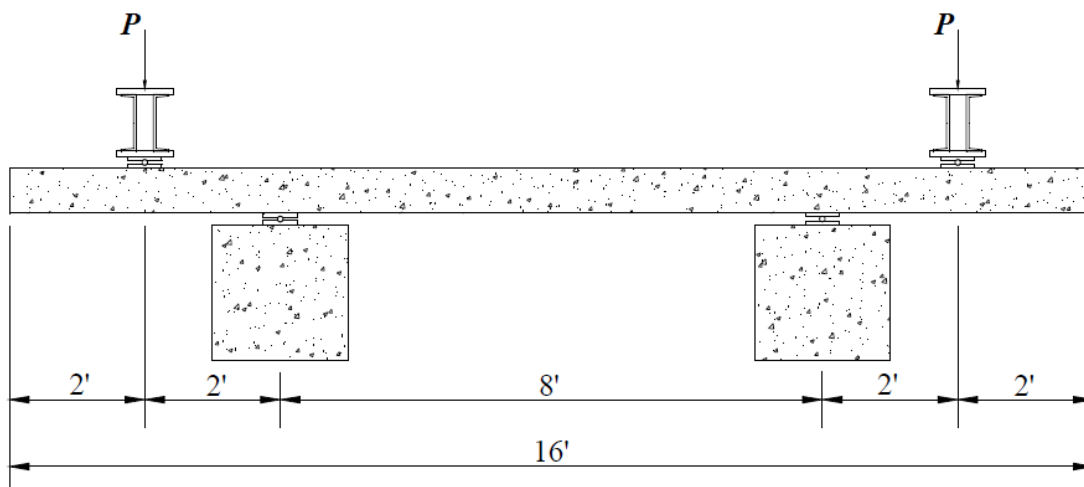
Slab Specimen Test Setup (Sim and Frosch, 2014)
